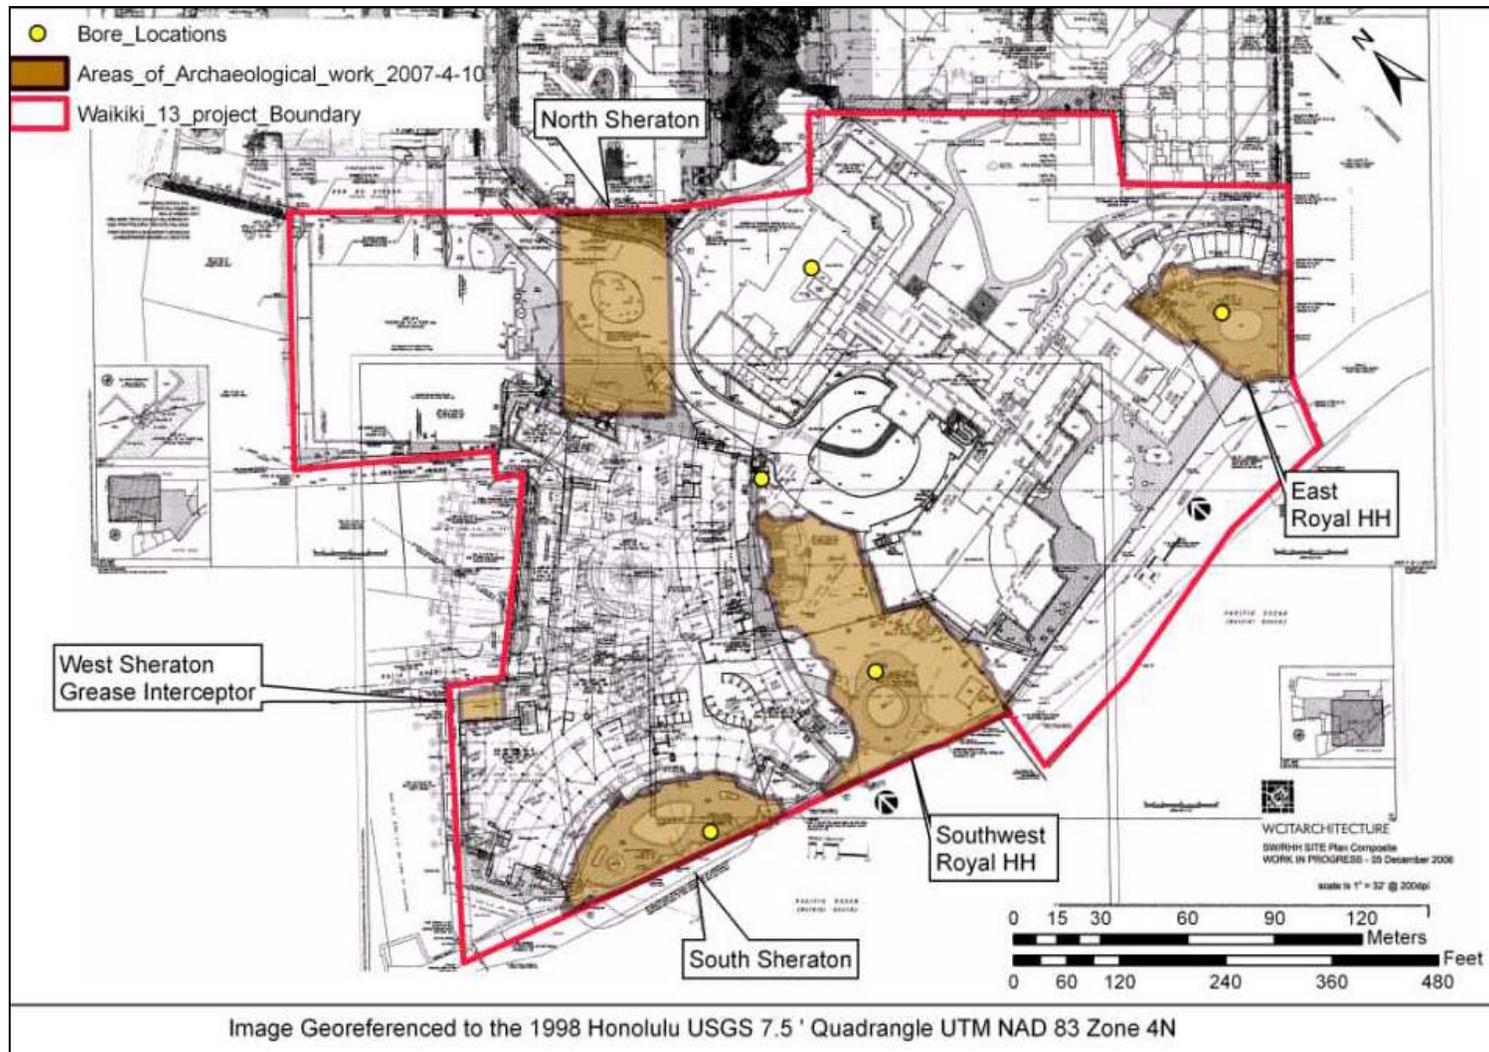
Site Plan showing SW/RHH property, areas of proposed work and overlay of proposed geotechnical testing locations
